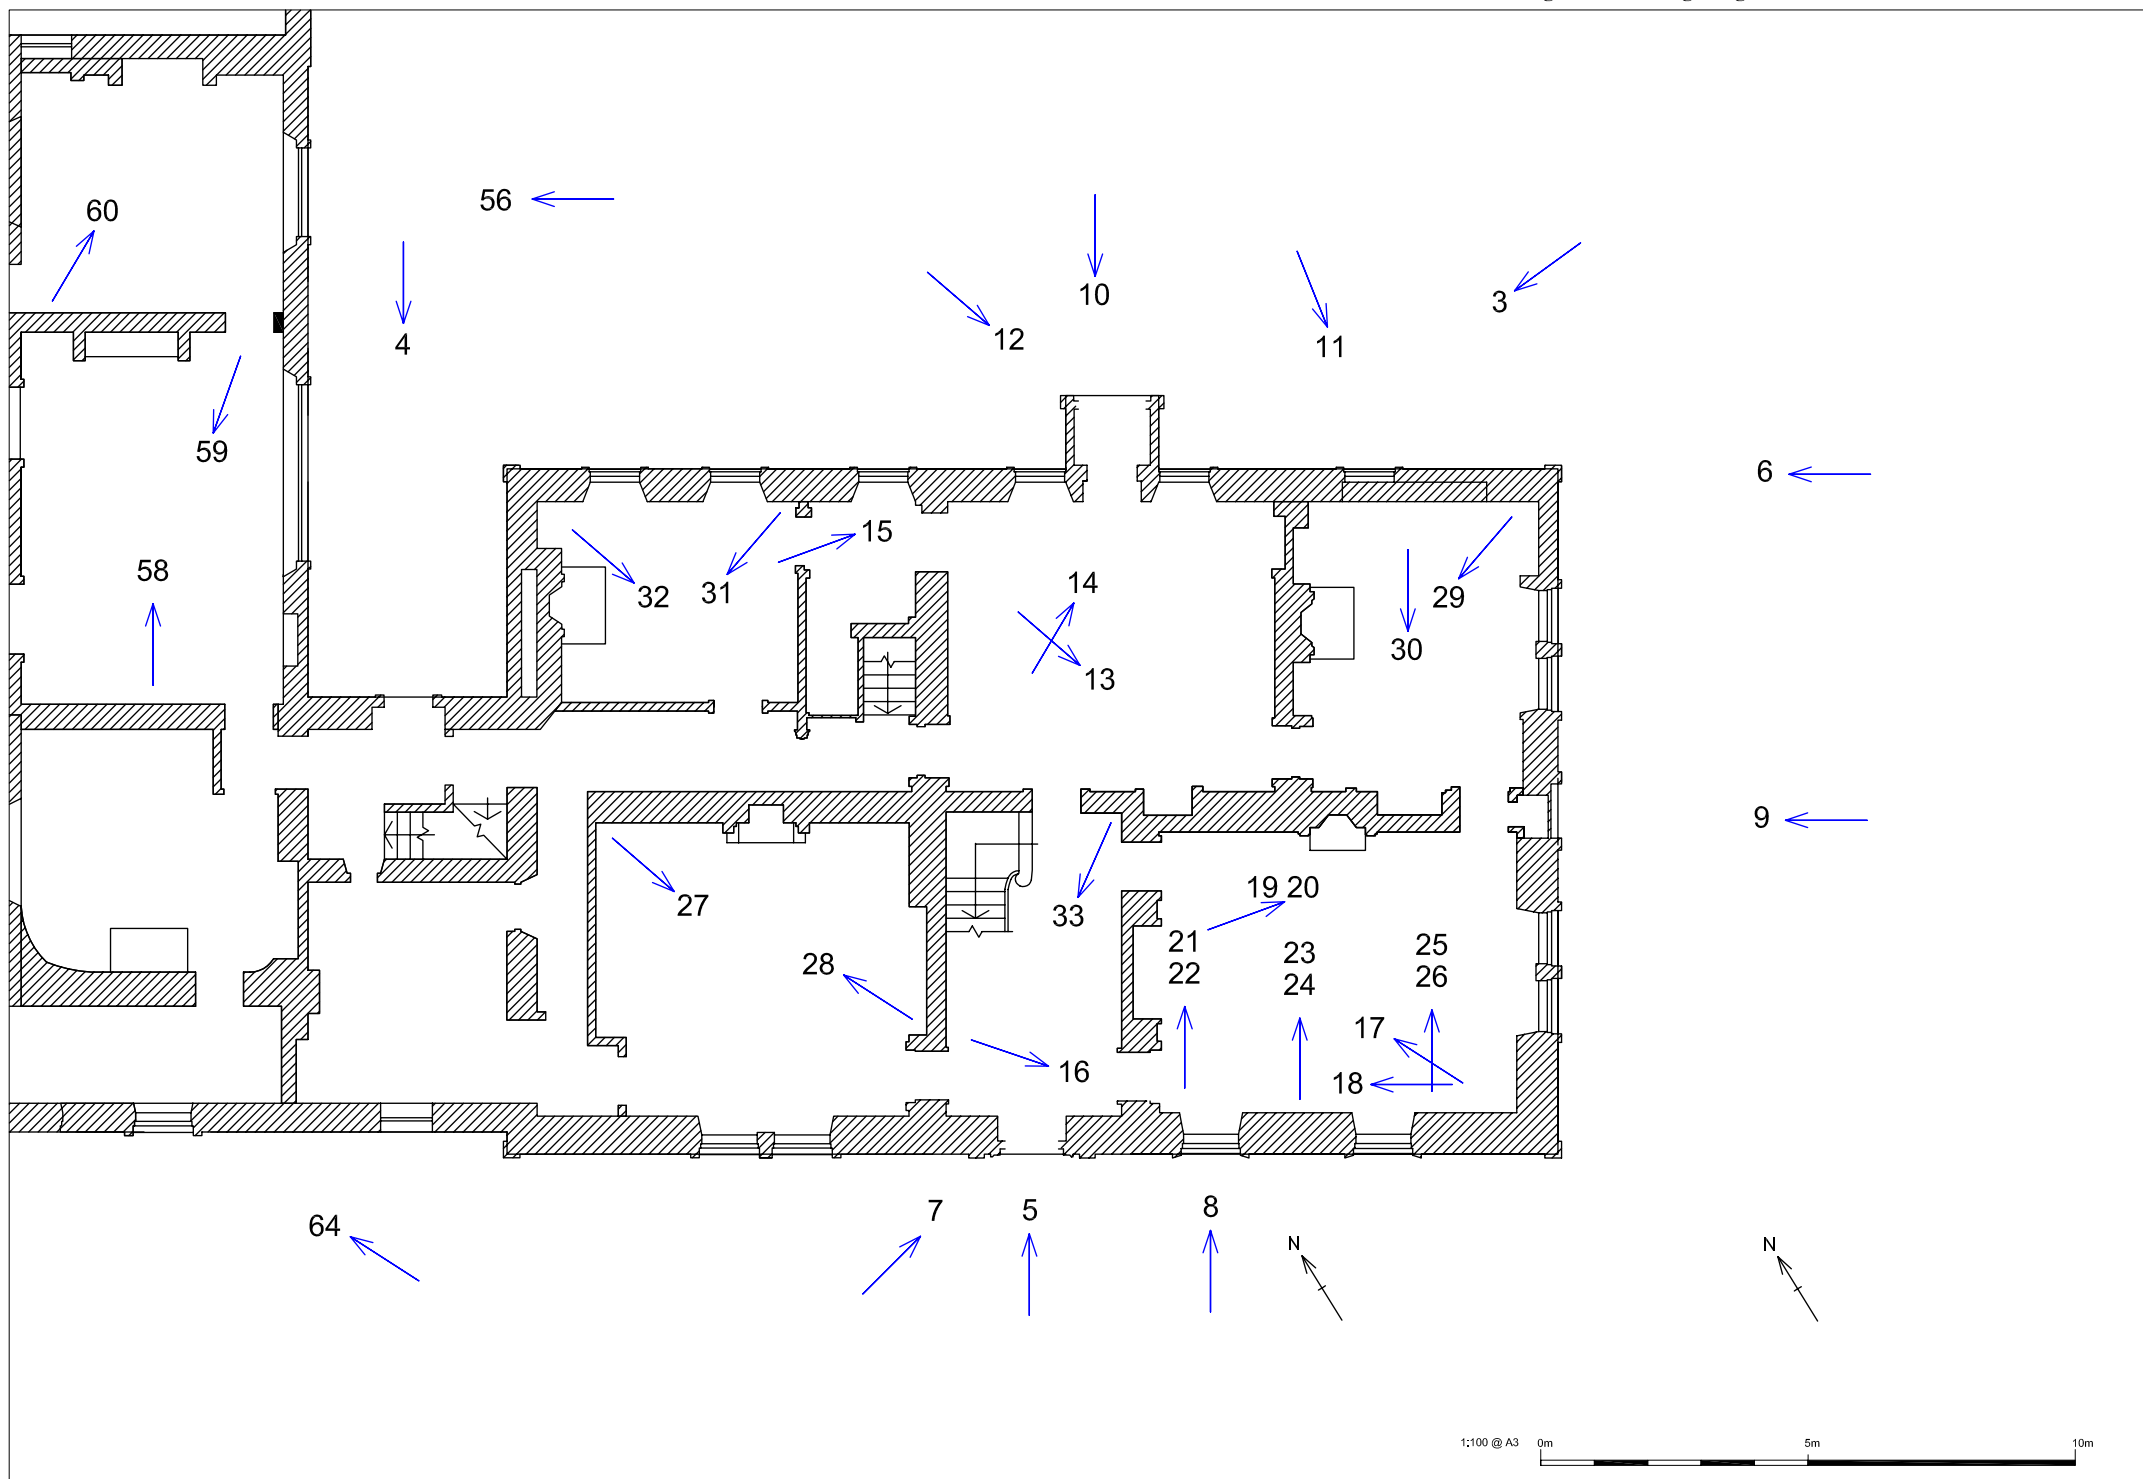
Photograph Location Plan: Ground Floor of Main House
